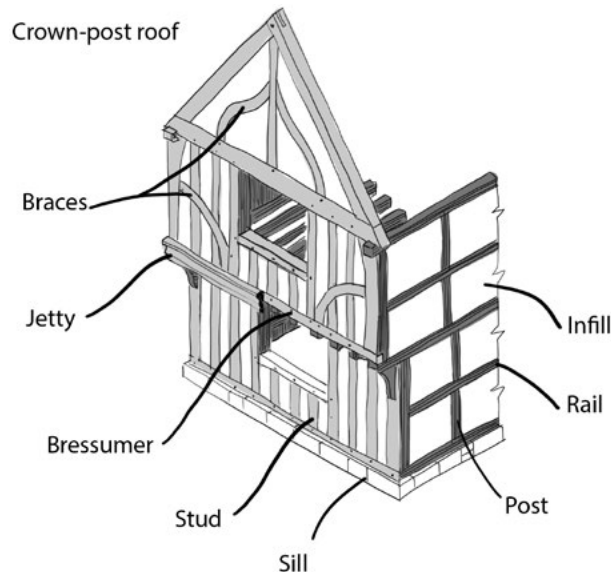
A sketch of the building principles of timber-framing i.e. construction parts from Pevsner’s Architectural Glossary.²
